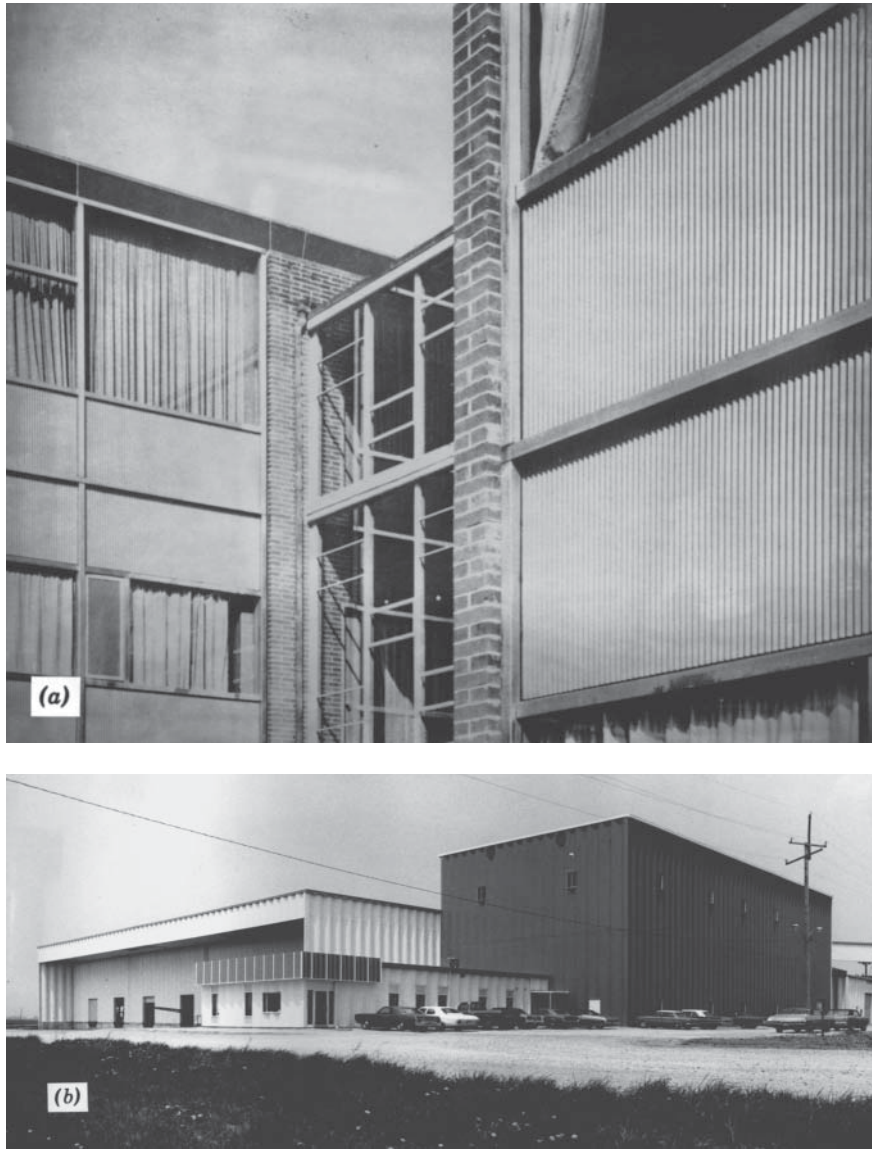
(a) Exterior curtain wall panels employing corrugated steel sheets.^{1.87} (b) Frameless stressed-skin construction. Courtesy of Behlen Manufacturing Company.
